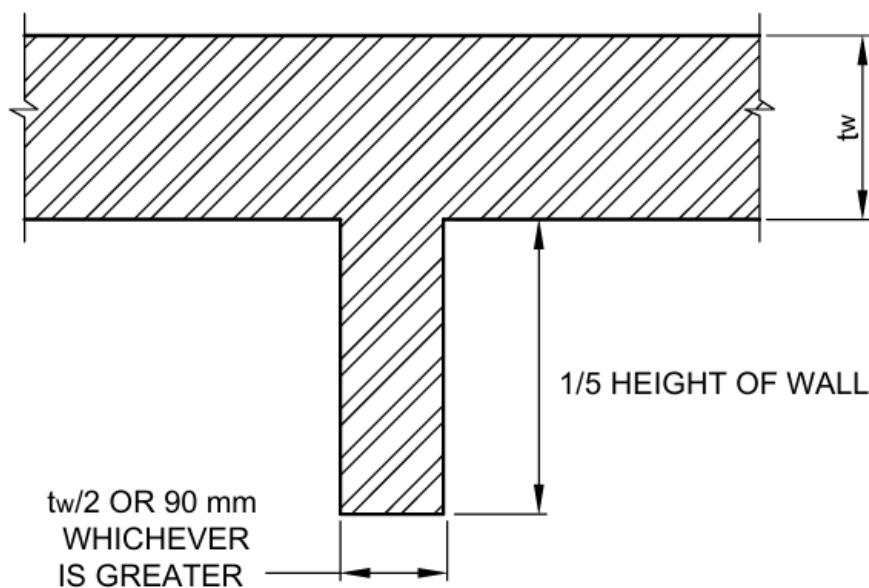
MINIMUM DIMENSION FOR MASONRY WALL OR BUTTRESS EFFECTIVE
